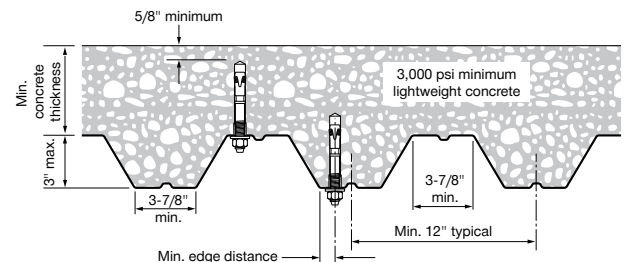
Lightweight Concrete Over Metal Deck Installations
